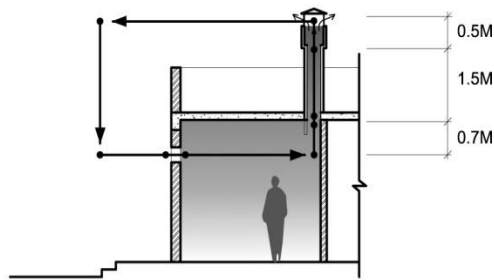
SECTION CC' THROUGH THE TOILET – CASE (A)
